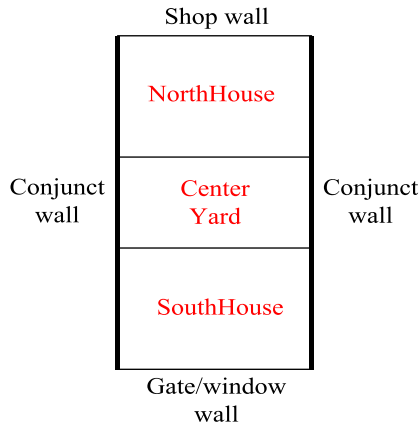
A typical topology existed in southeast China vernacular house, the unit is normally a rounding architecture; it includes the central yard, a shop wall, gate–window wall, two conjunct walls and two houses.
